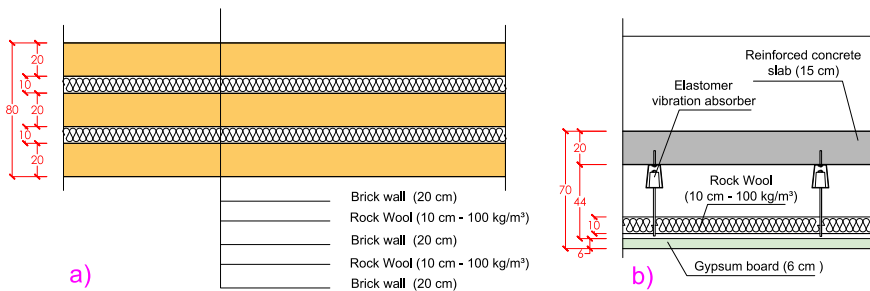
Section of the multi-layered wall and roof details (without exterior cladding system), a) wall, b) roof
